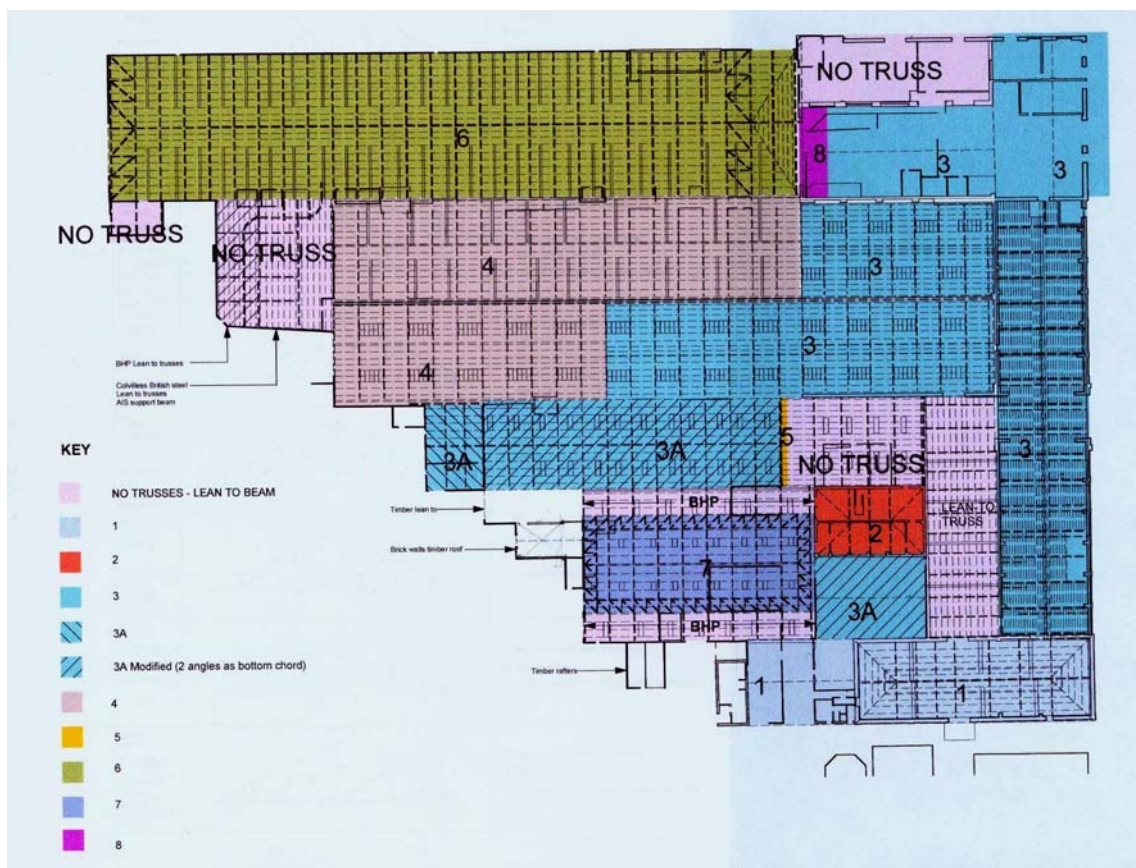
Engineering Workshops—Roof Truss Identification Plan (Design 5 Architects).
